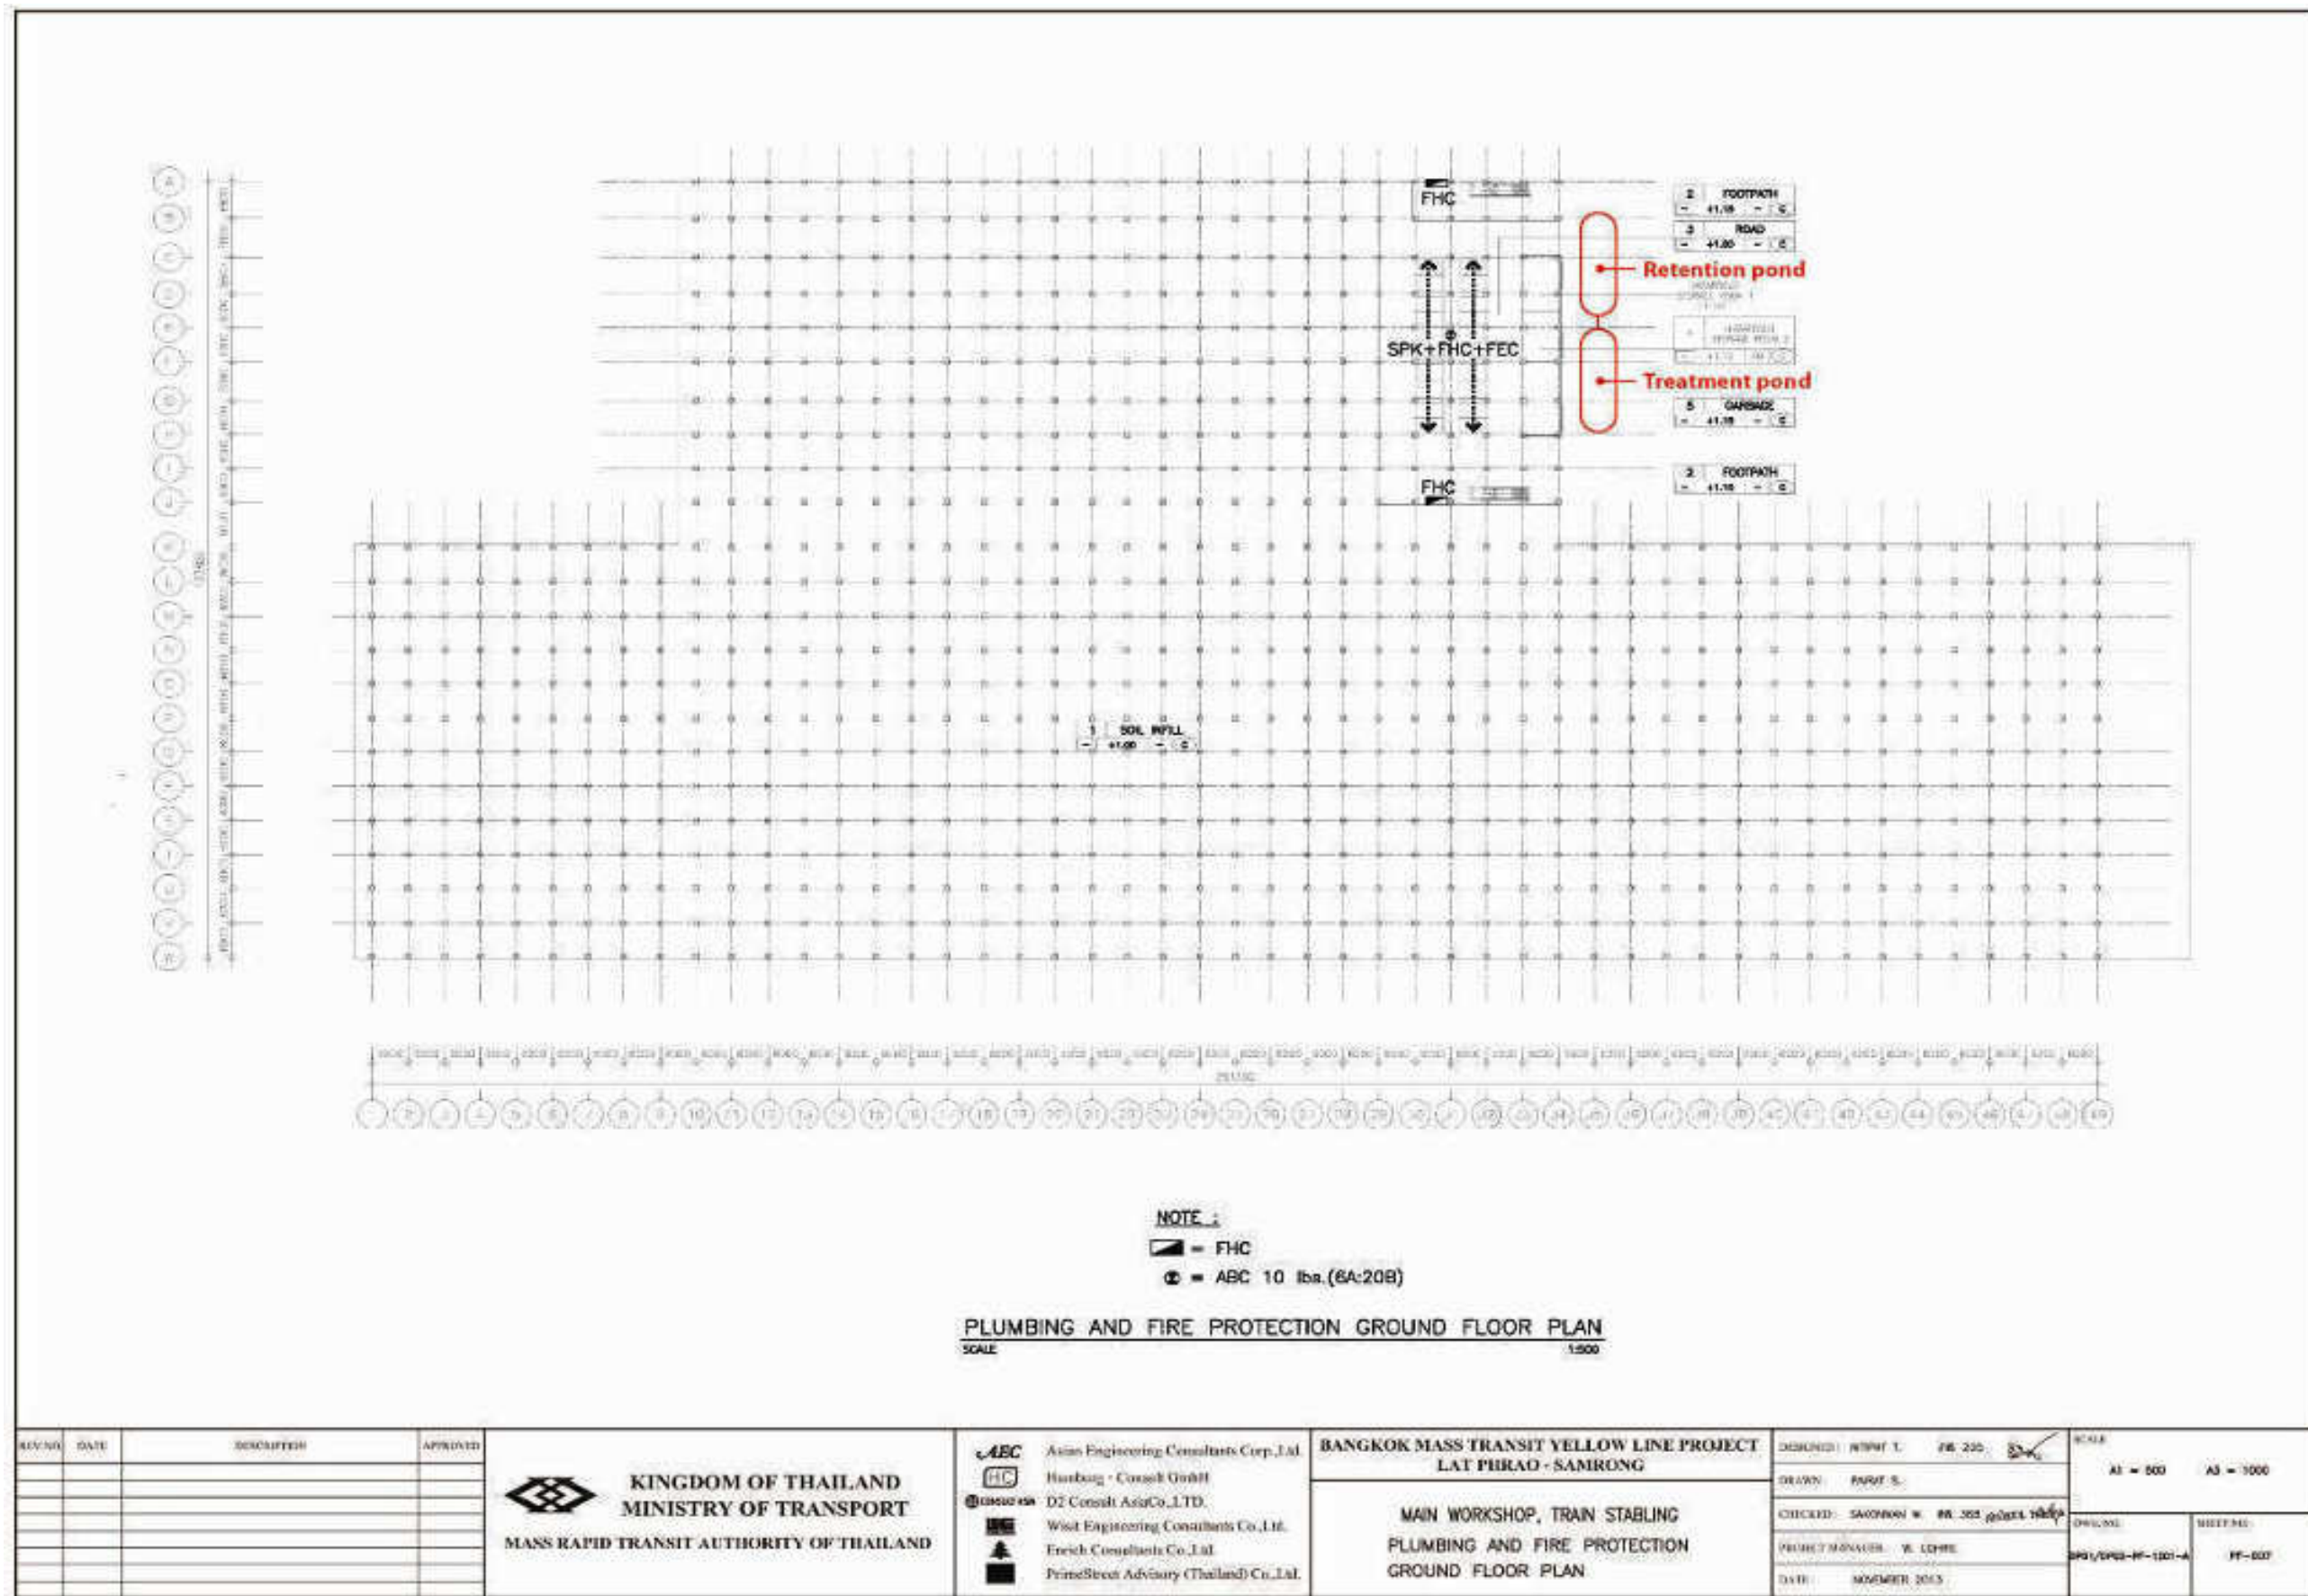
2 Retention pond at ground floor of Main Workshop and Train Stabling
